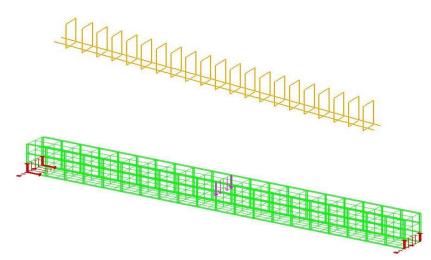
Finite element model of reinforced concrete beam (top: reinforced bars modelling; bottom: concrete beam modelling) – Orange colour is reinforcement elements, green colour is concrete brick elements, red colour is support restrains, and burble colour is applied load
